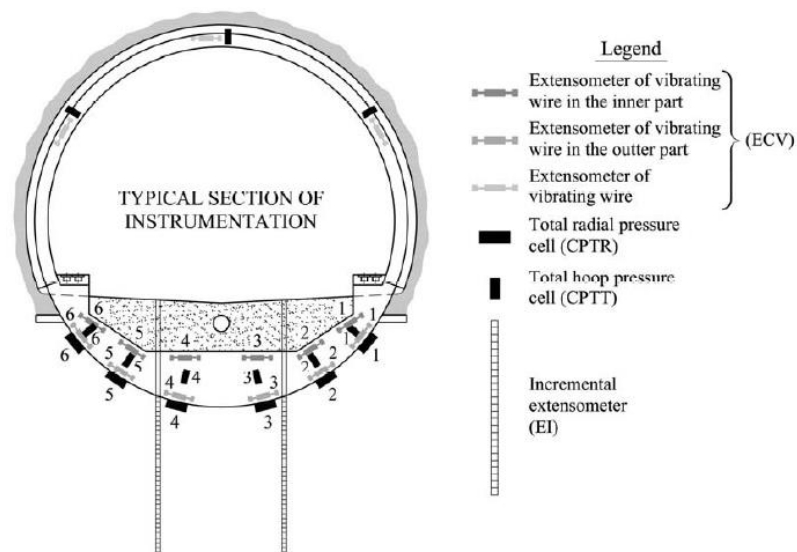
Typical instrumented section of reinforced tunnel with instruments in vault and invert (Ramon, 2014)
